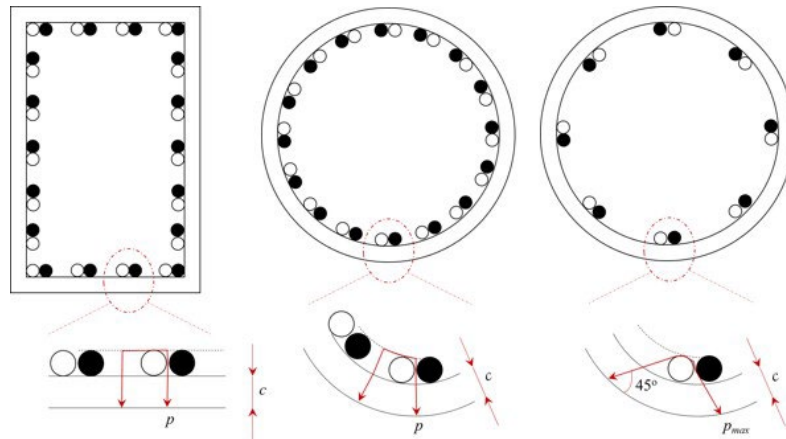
Perimeter of concrete block during lap-splice failure (Priestley et al., 1996): white and black circles represent the two lapped reinforcements.
